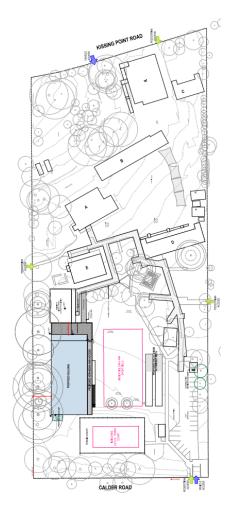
Proposed Scope of Works (Source: Fulton Trotter Architects, Proposed Site Plan (Rev P5))
